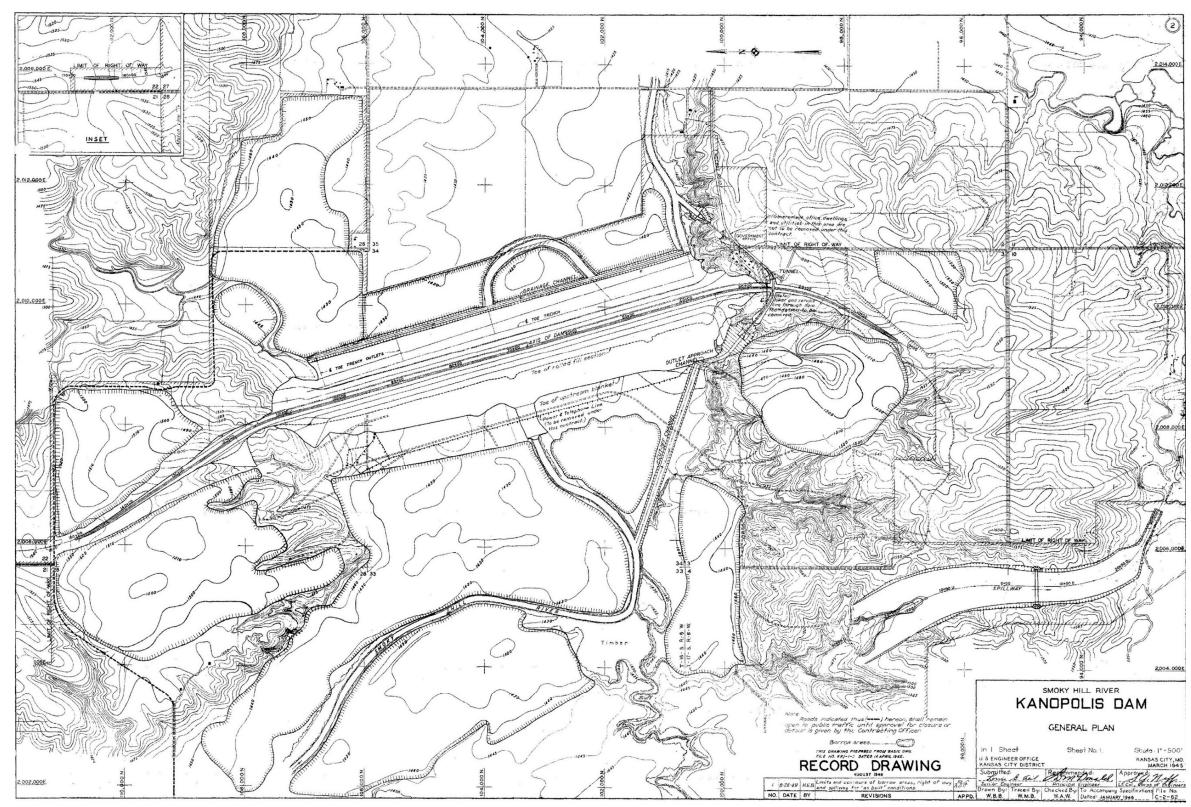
Kanapolis General Plan Drawing (USACE, 2016). Elevations in NVGD 29.
